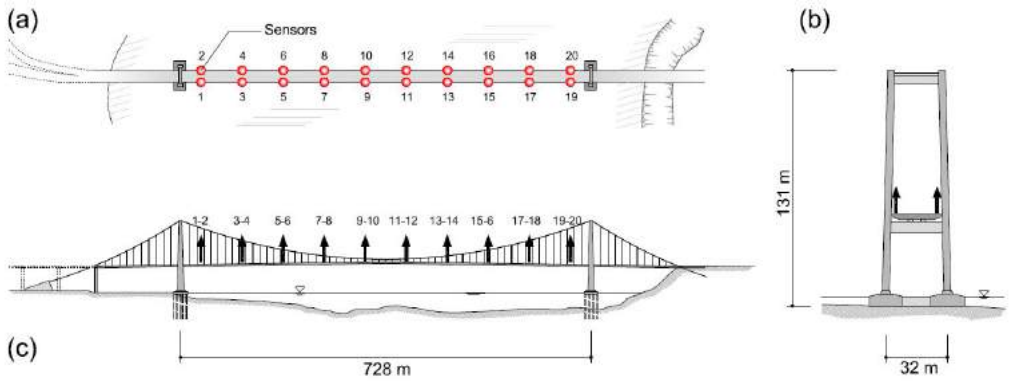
Case study bridge (NCB) with ideal sensors' layout: plan (a), cross section (b) and elevation (c).
